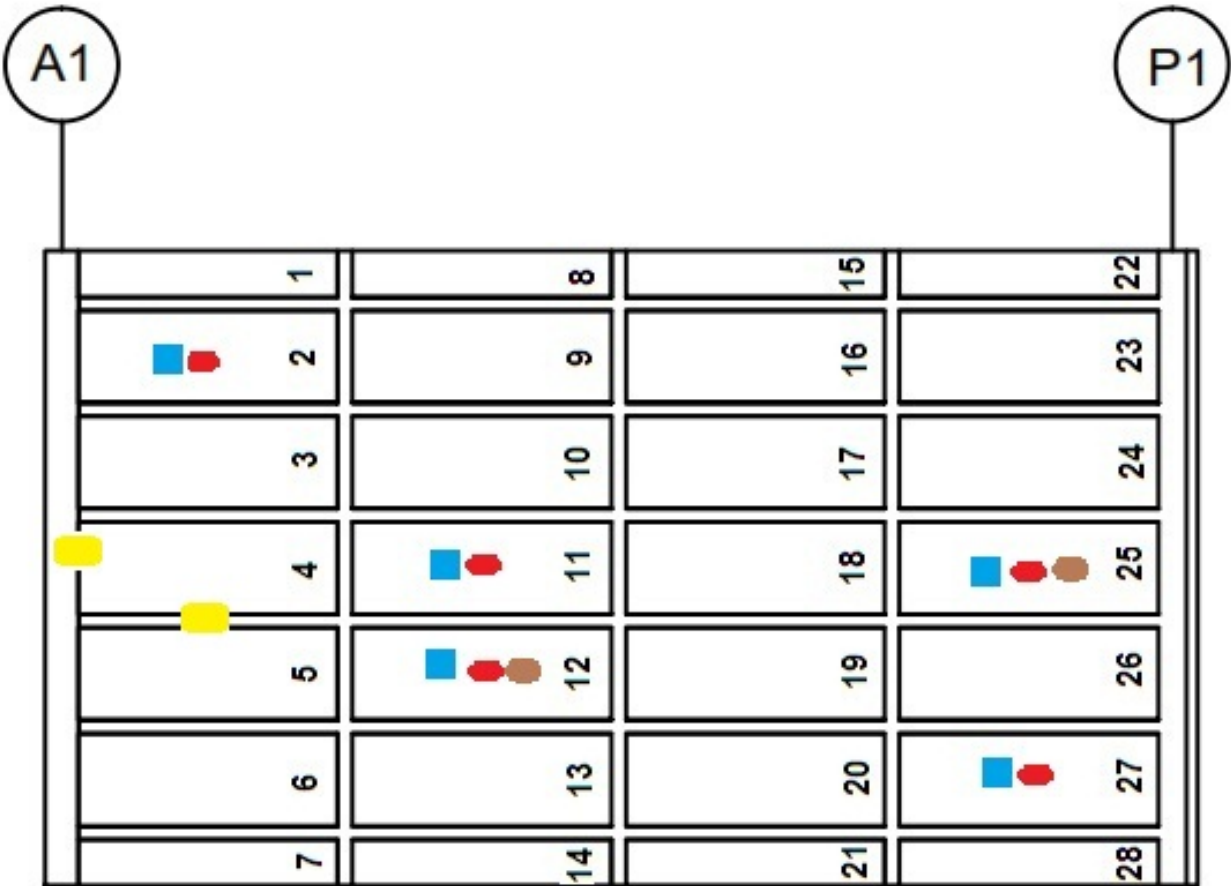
Tests conducted at various locations between Abutment A1 and Pier P1
